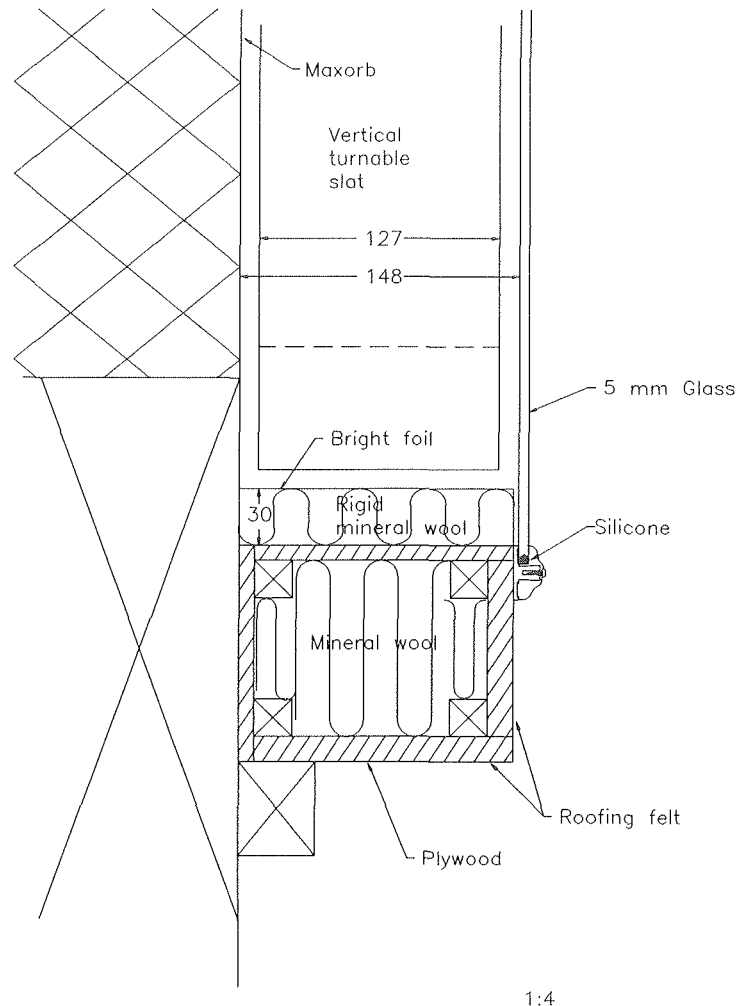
Vertical section. Details of the bottom of the solar wall with the blind.
